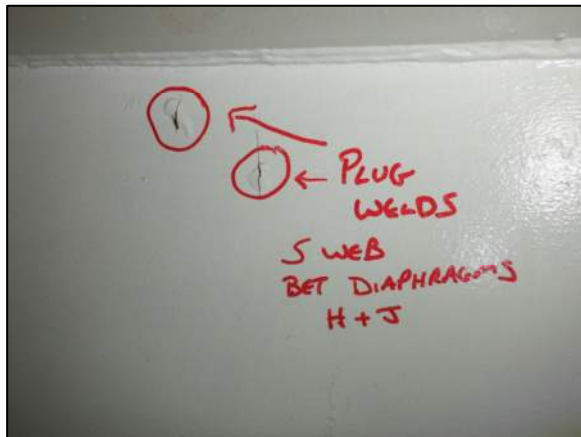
Plug Welds in South Web Between Girder H And J
